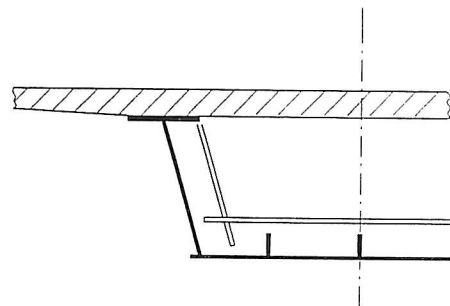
(a) Cross-section of a box beam with composite concrete top flange
